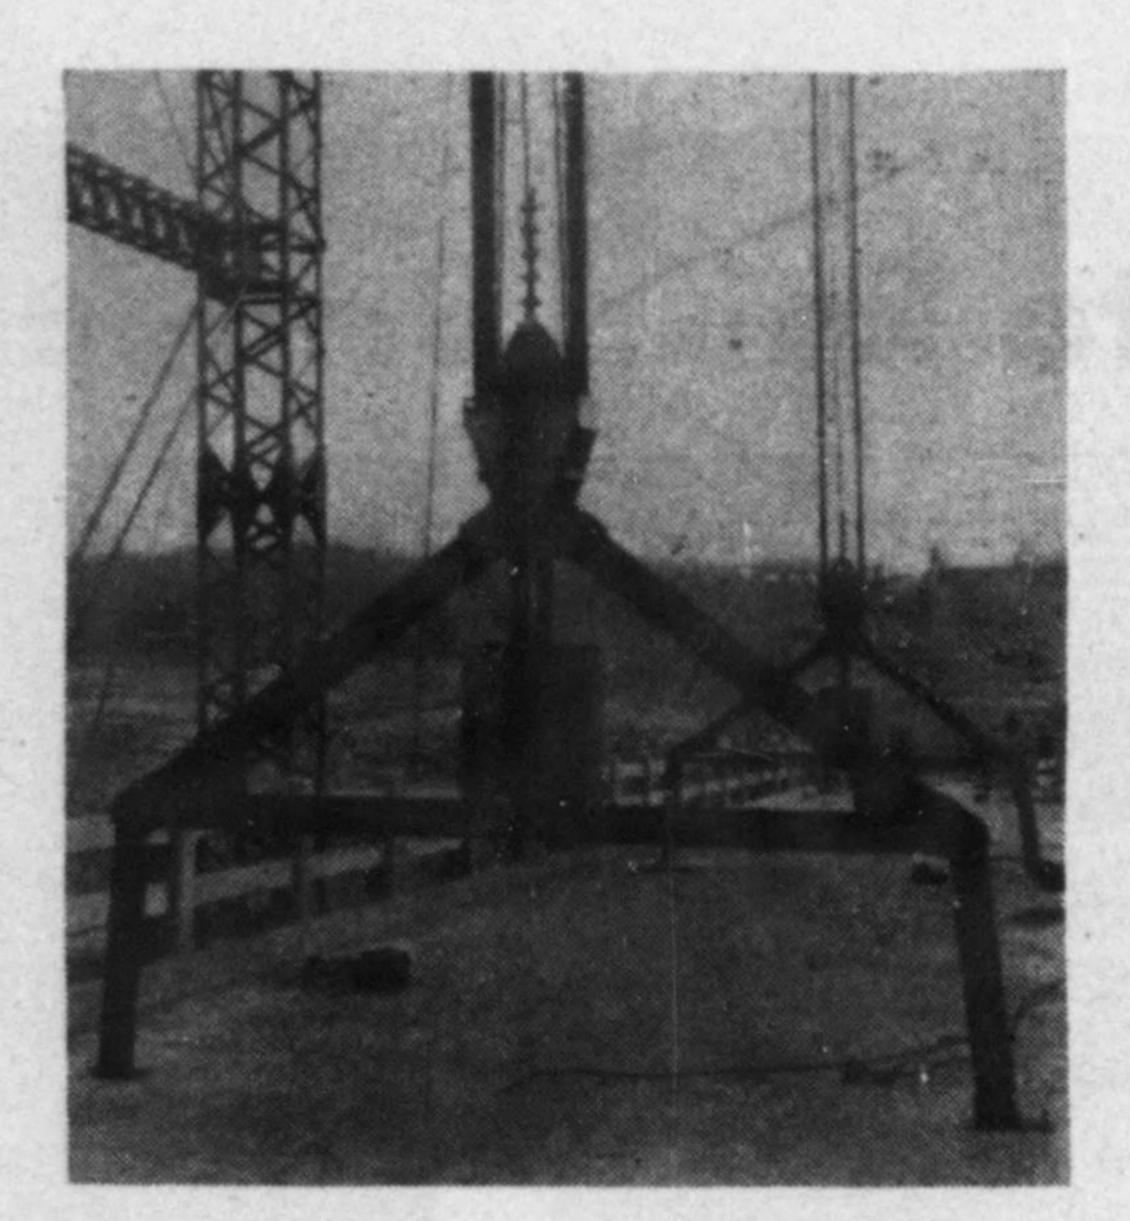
The hitch to the needle beams below the deck was made through two holes cut in the floor at each beam.
